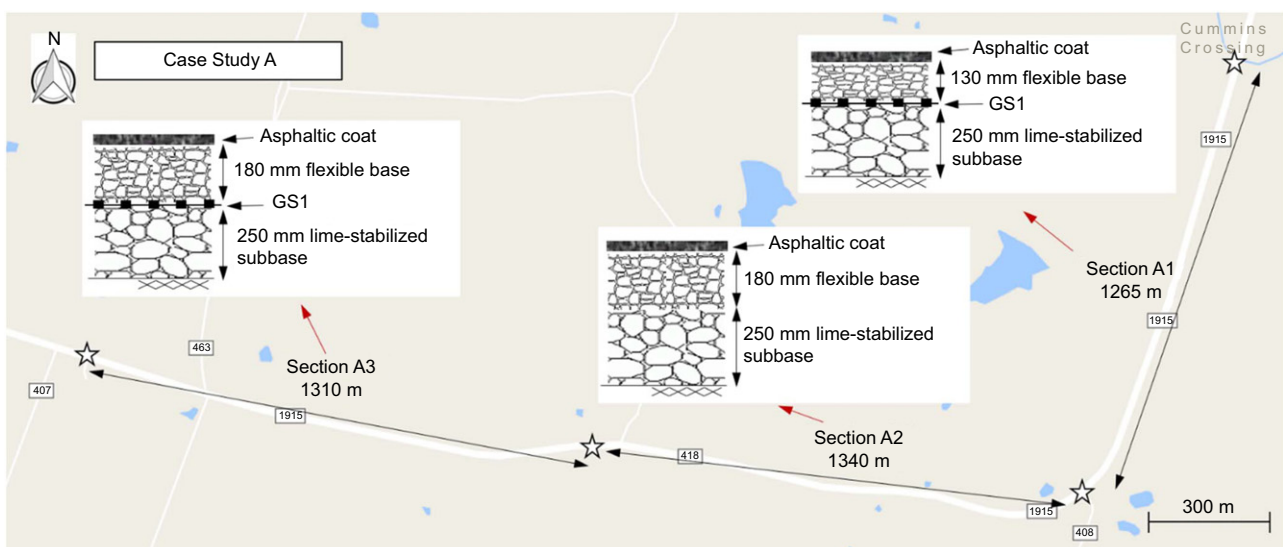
Layout of FM1915 test sections and corresponding road profiles (Case Study A)
